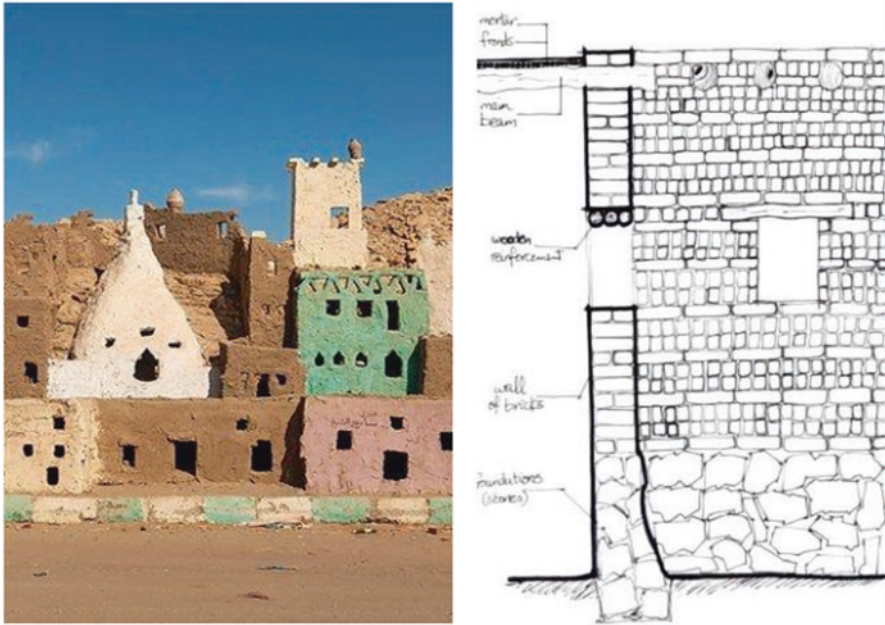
Elevation and section in Bahariya house. *Source:* Mohamed et al. (2015)
